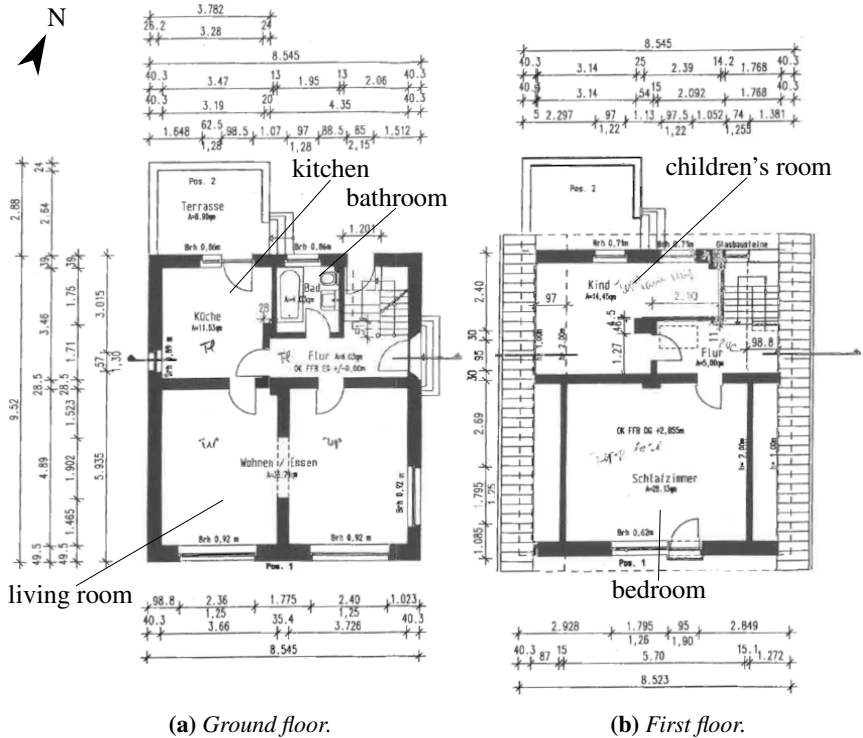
Construction floor plans of the two heated storeys of the case study building with room labellings.
